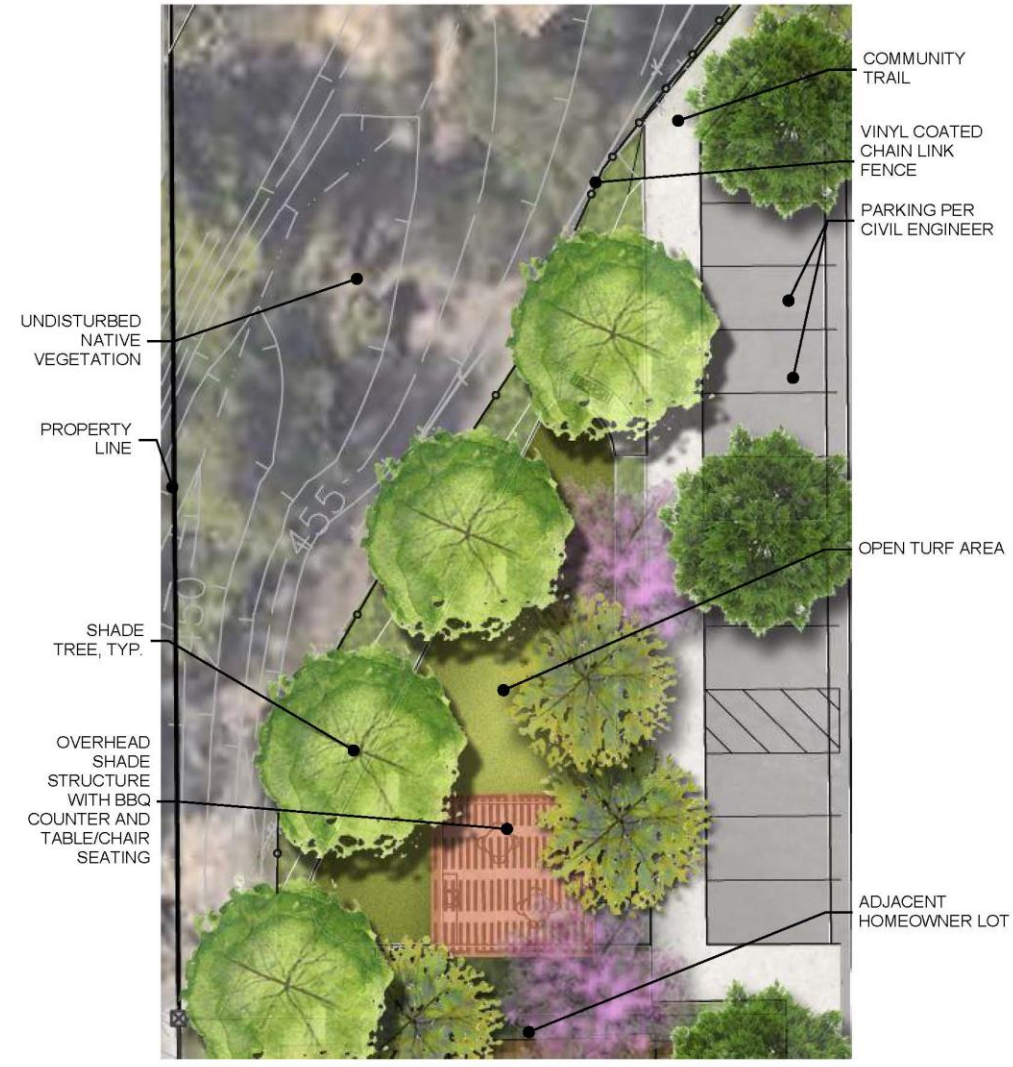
Central Open Space (OSR-3) Conceptual Plan
